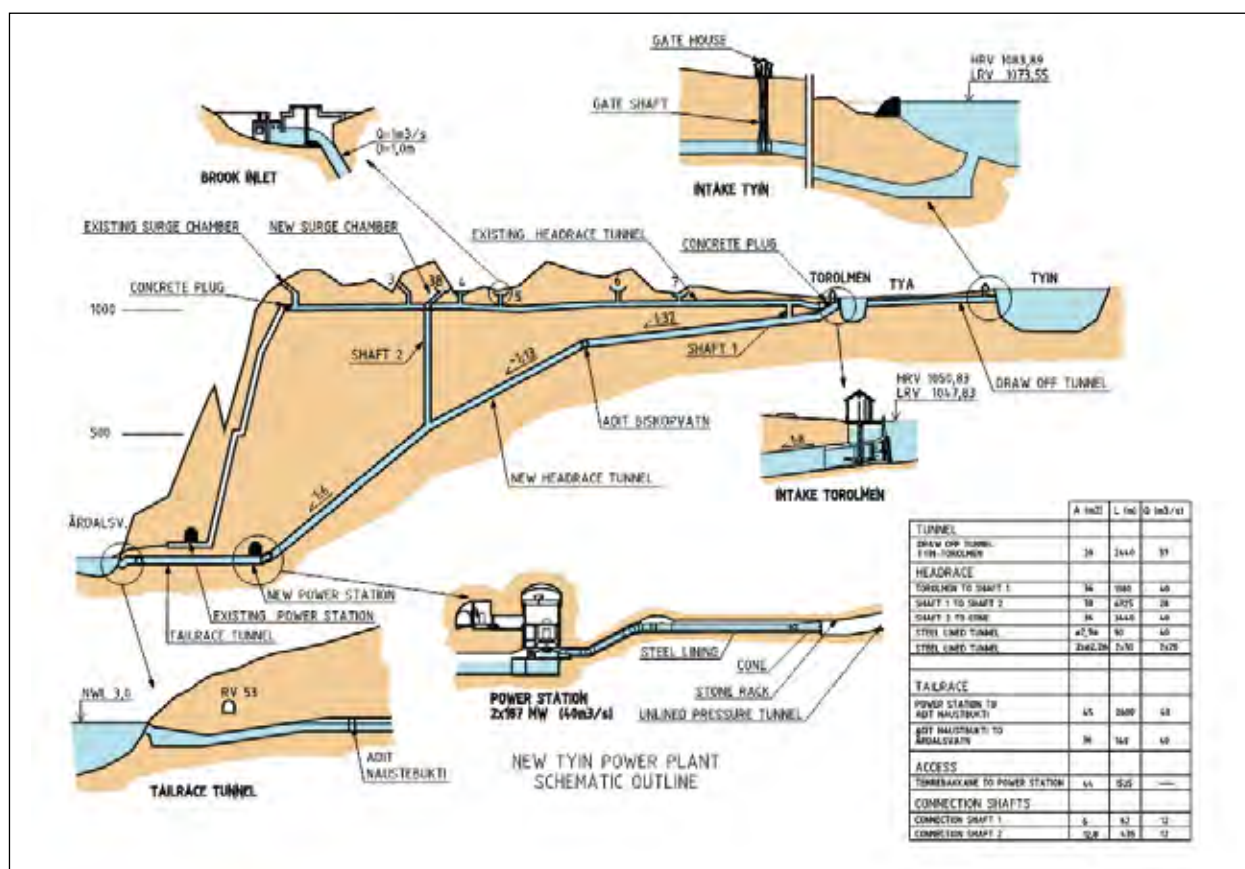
The new TYIN. All parts are new save the old headrace tunnel that is now used for eight brook inlets, adding water to the system. Courtesy Norsk Hydro/Knut Helgesen
